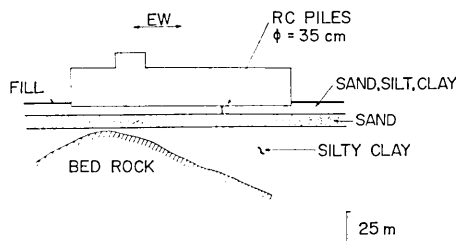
Foundation and soil condition of the Akita Prefectural Building.
